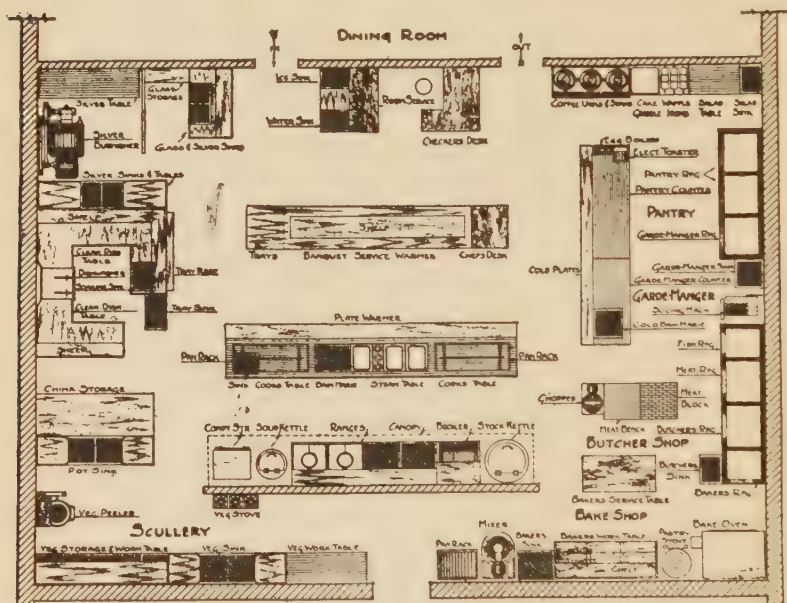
Study of a kitchen for a 250-room European plan hotel. This was planned by the St. Louis Stewards' Club. It is an excellent plan for students to work along similar lines—and then have practical men or women criticize the plans.
